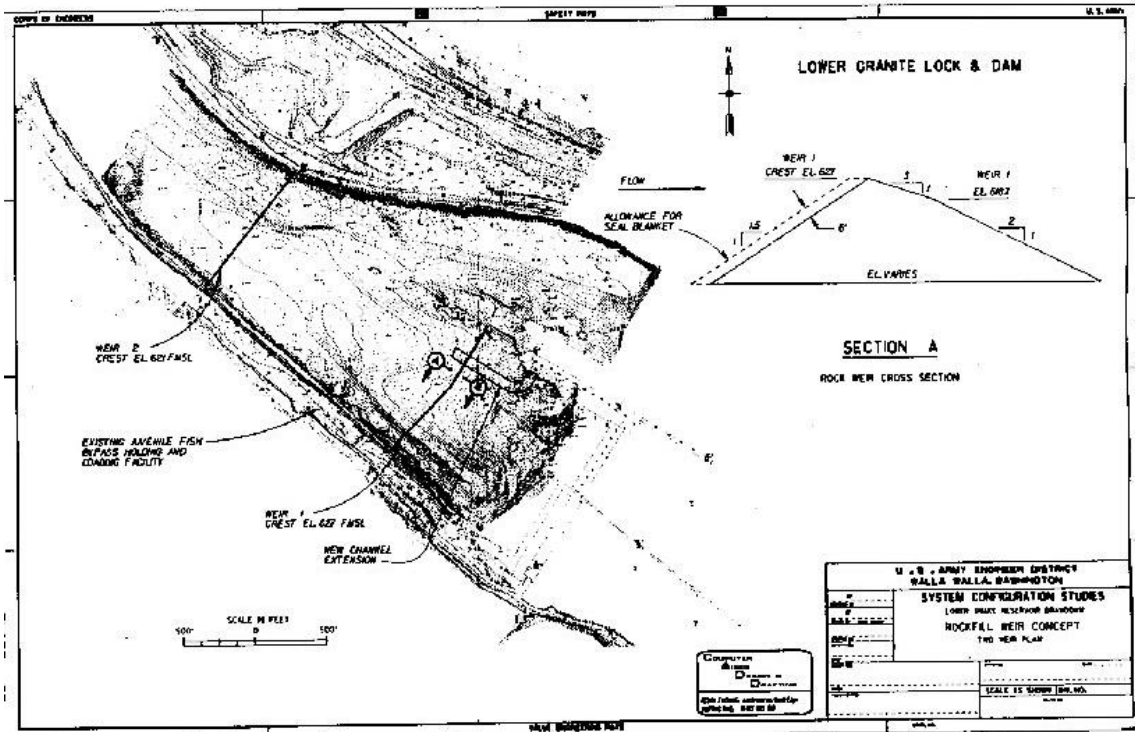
Rockfill Weir Concept--Two-Weir Plan
